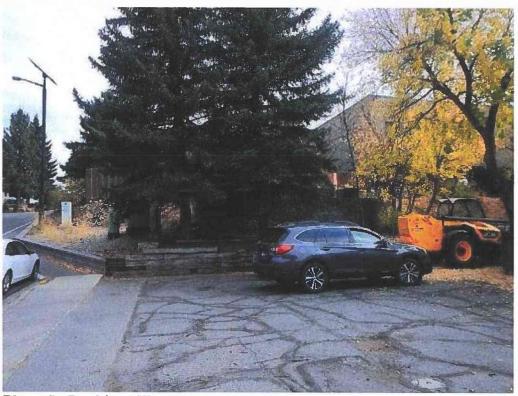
Looking NE toward property corner post (in front of green Cox box) Note: slope of land to the NE; railroad tie retaining wall; concrete wall hides electric transformers
